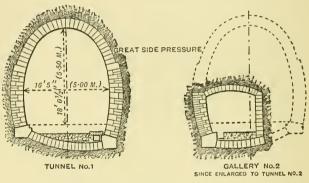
SECTIONS OF TUNNEL NO. 1 AND GALLERY NO. 2.
